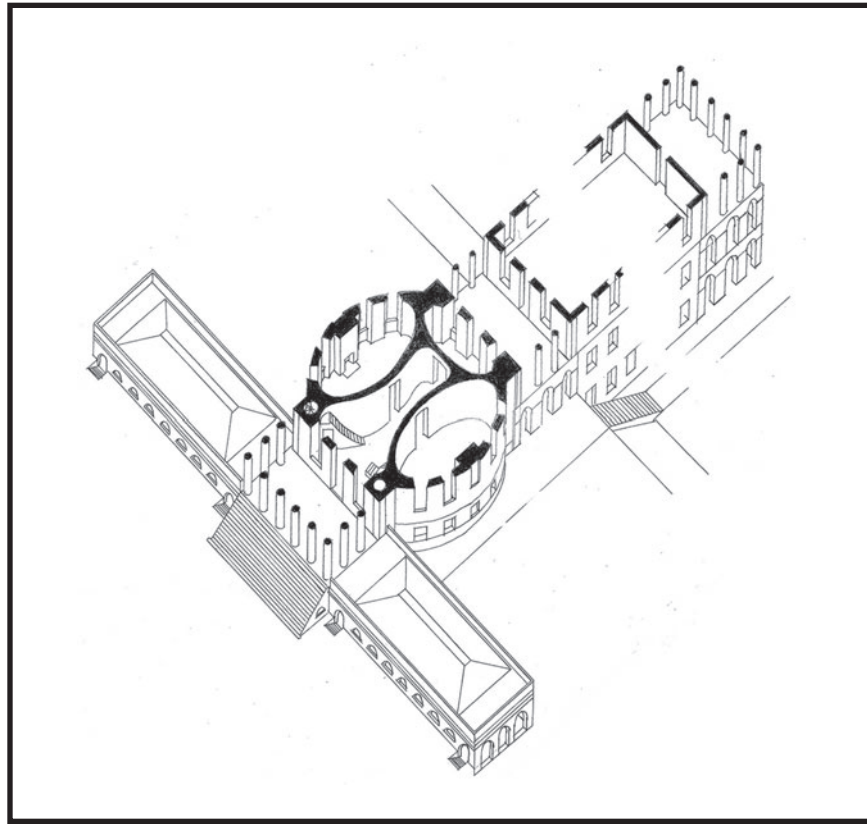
Sketch axonometric of the plan of the main floor of the Rotunda and terraces after the construction of the Annex. Note the hipped roofs on the terraces, constructed in 1841. Drawing by John G. Waite Associates, Architects, 2007.
